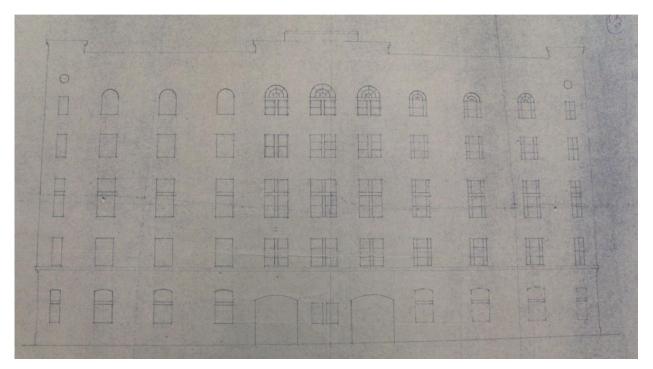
Elevation drawings showing windows of Irving Street Brewery buildings: South façade of buildings 22 and 23 by the Department of Building Materials, Drawing No. M24708 dated 28-04-50
